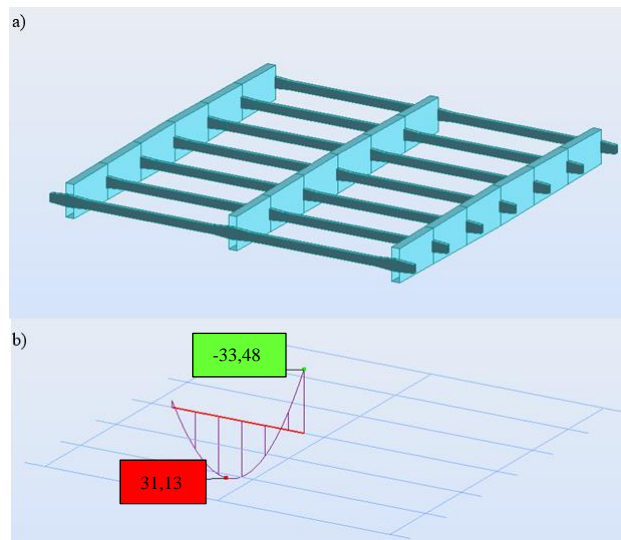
a) Schematic diagram of the reinforced concrete grid of the roof of the central aisle, b) calculation results – determination of the maximum rib span moment [11]
